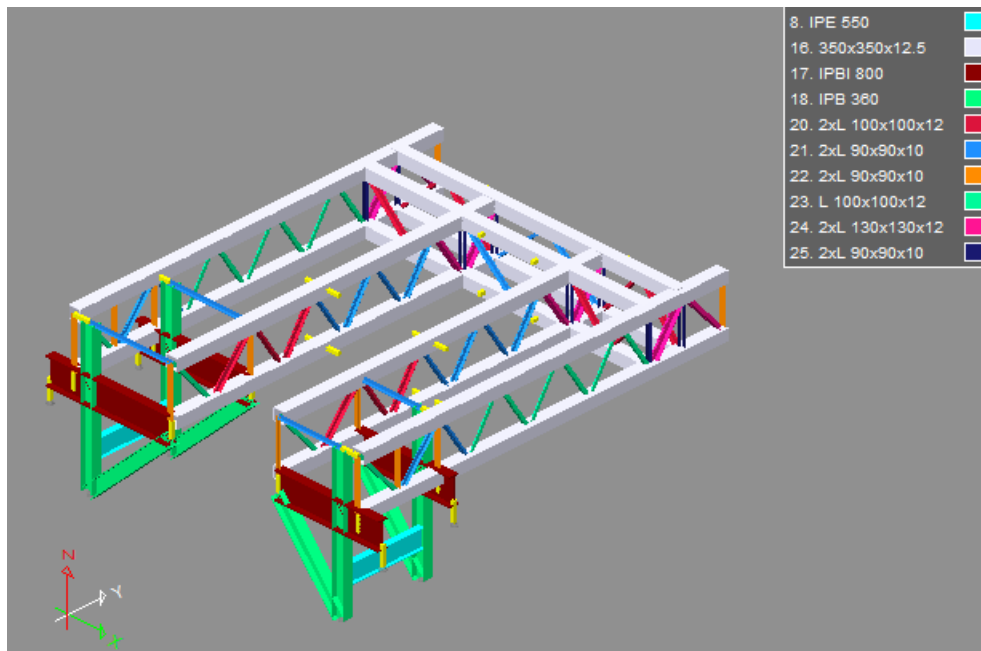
Solution 6-2, improved structural layout - 3D view
